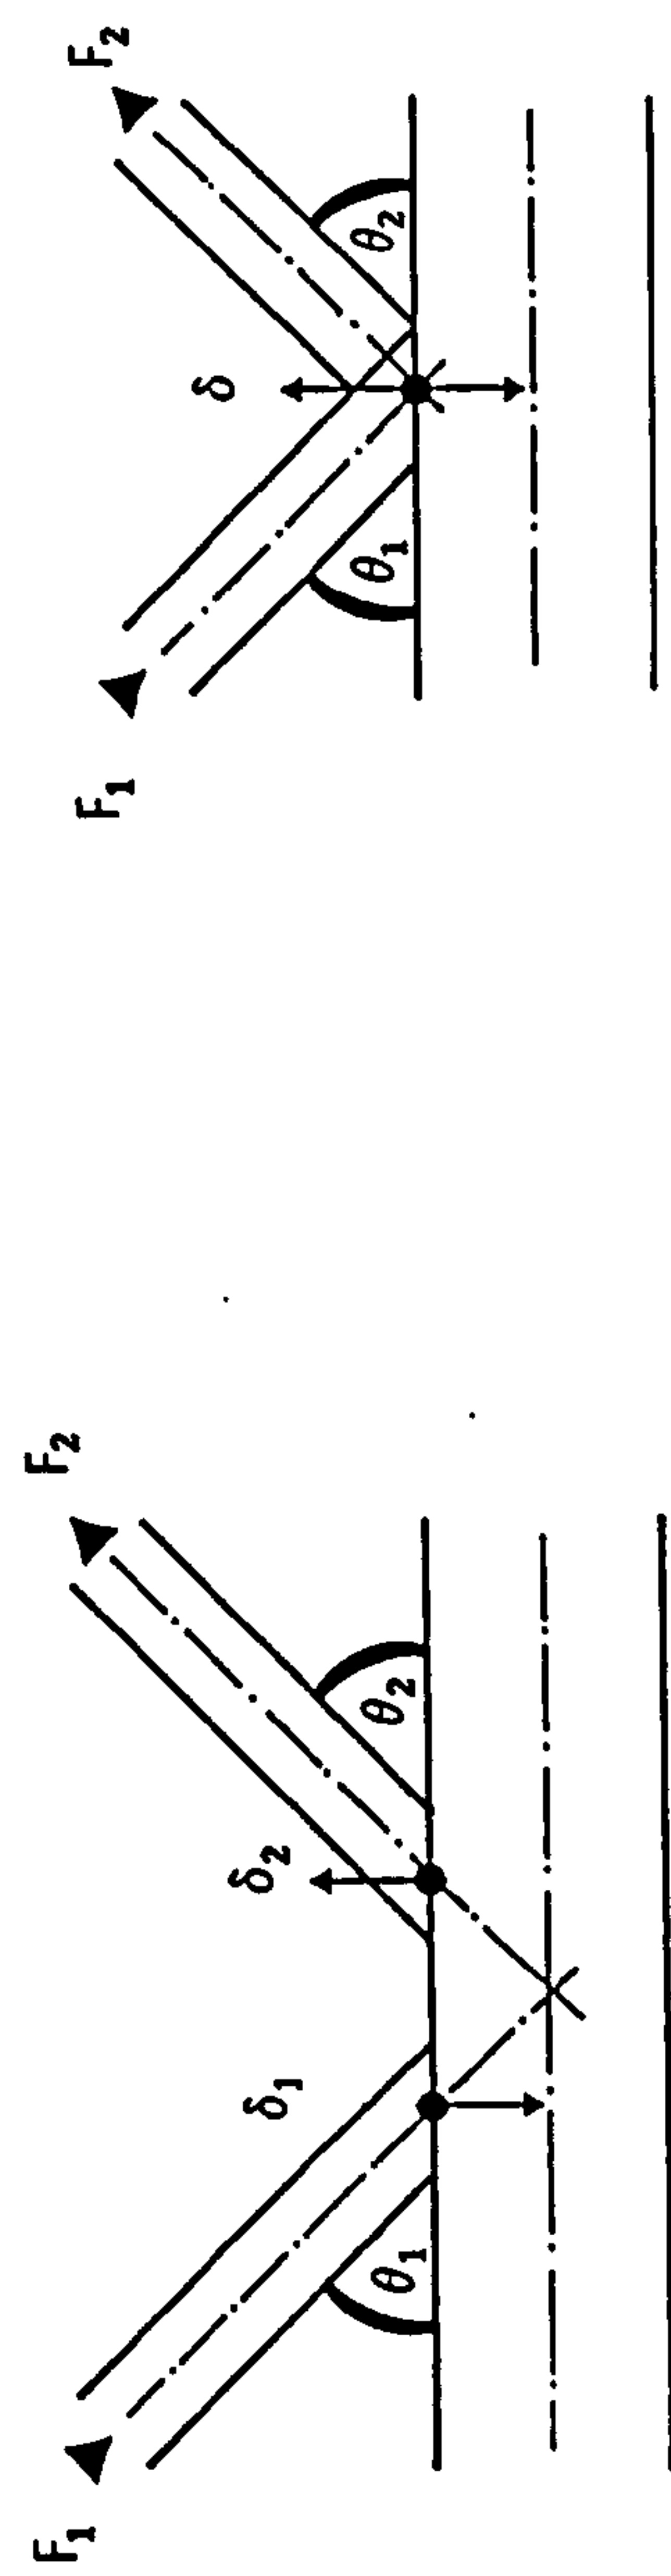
Plane frame modelling of gap and 100% overlap joints.
